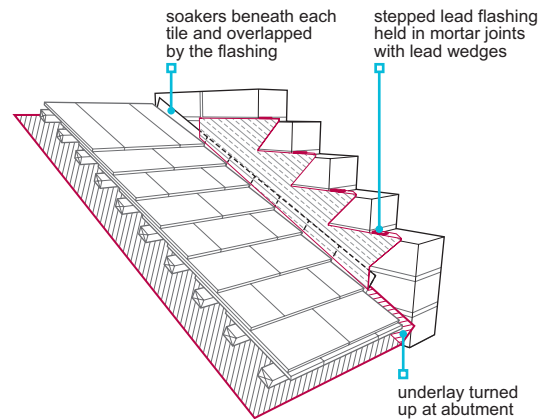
Side abutment (double lap clay or concrete plain tile and slate)
